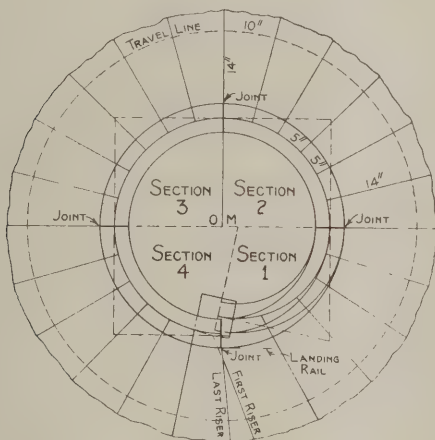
Plan of a Circular Stairway, the Rail to Be Made in Four Sections—Scale $\frac{3}{8}$ In. to the Foot
